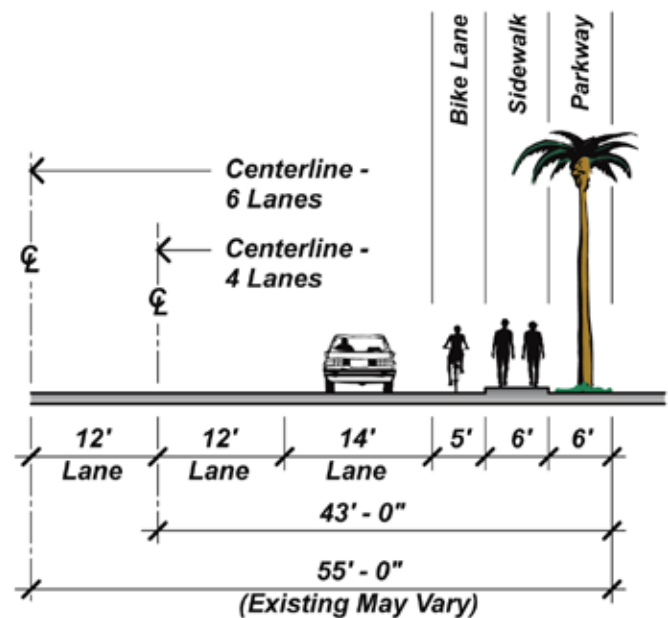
Typical cross section for Vandegrift Boulevard.
